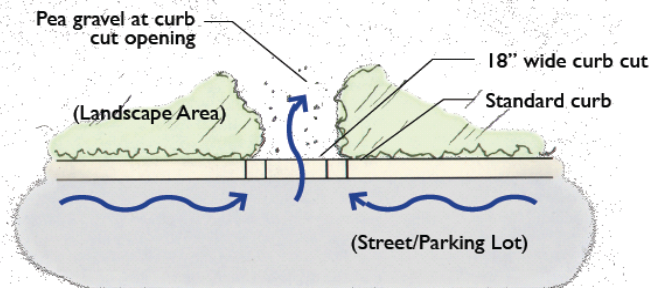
Standard curb cut: plan view (Source: SMCWPPP 2009)
